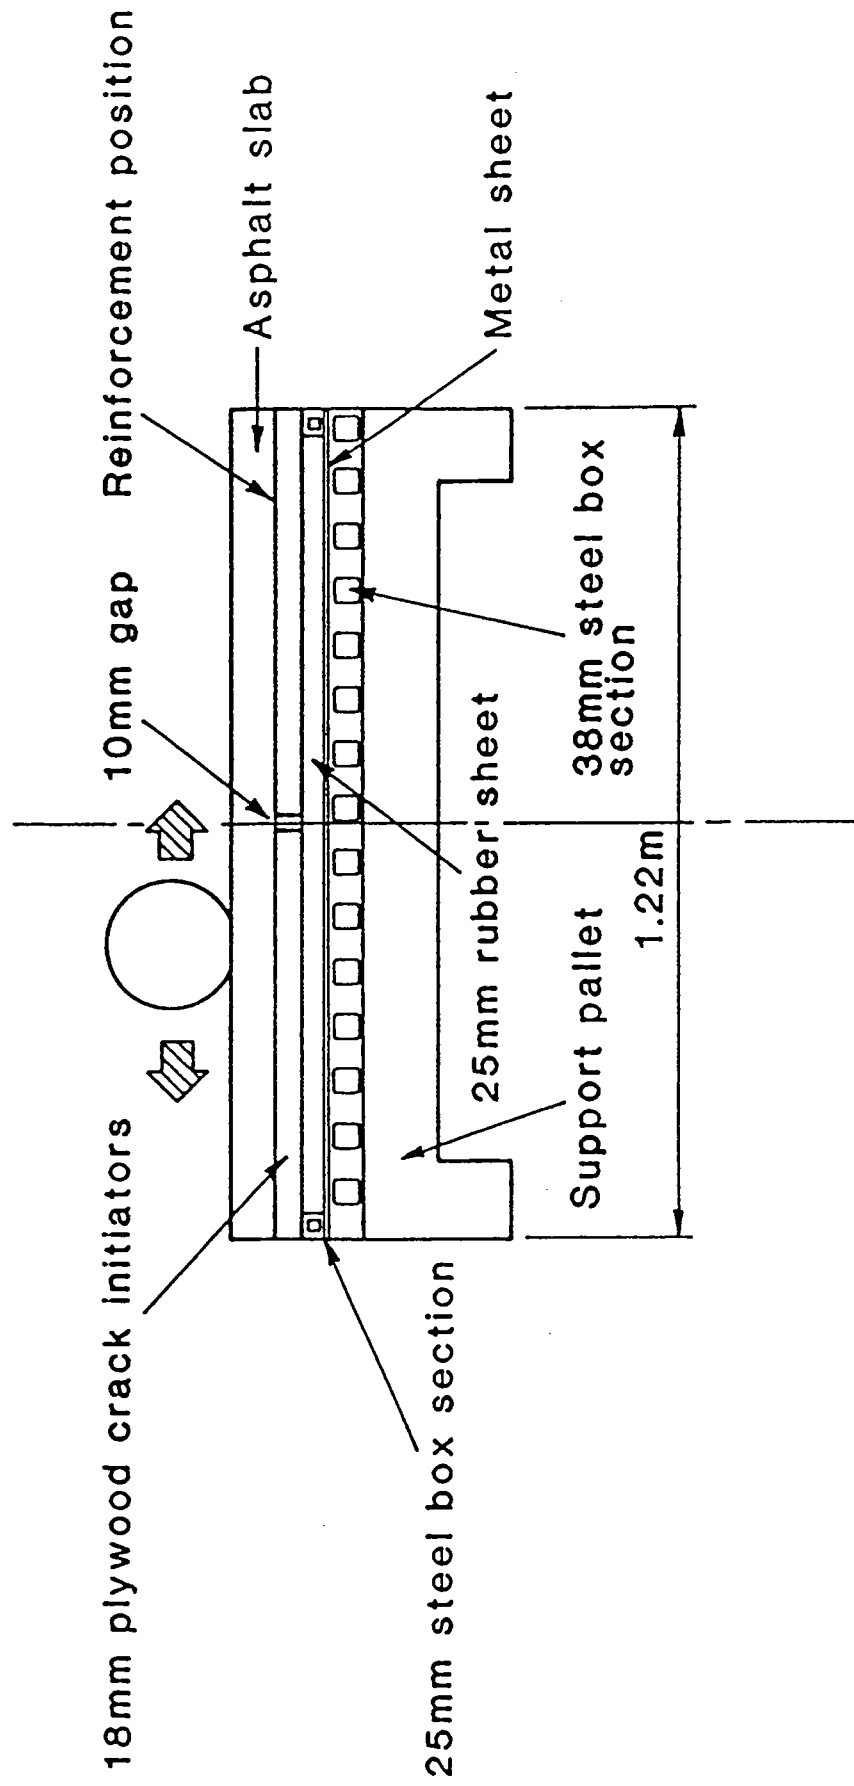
Specimen Arrangement in Slab Test Facility used by Hughes (44)
